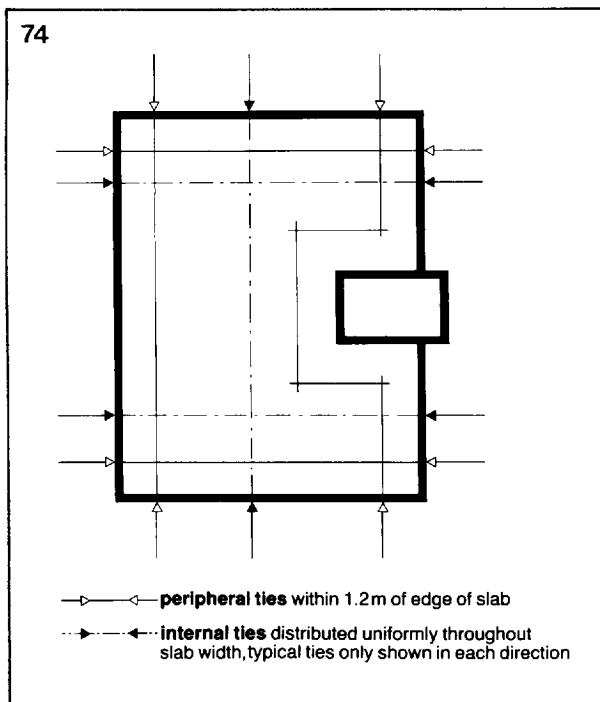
Typical floor plan showing peripheral and internal ties to comply with option 2 and 3 requirements for horizontal tying.
